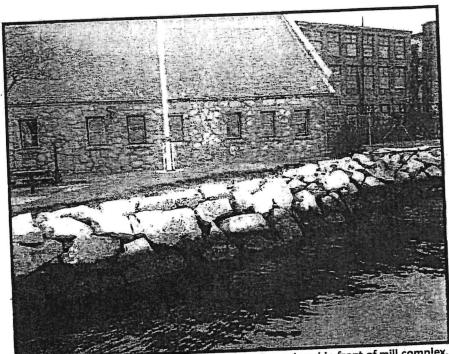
Concrete pad and chain-link fence to be replaced in front of mill complex.
